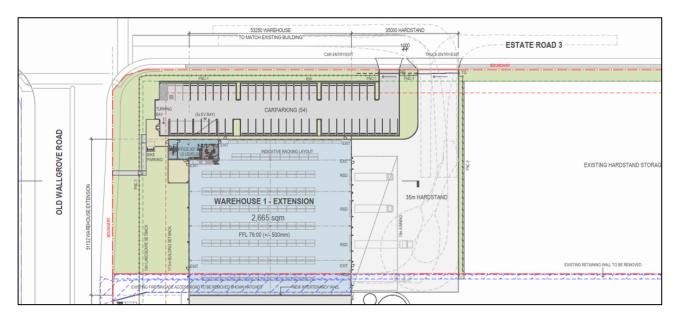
Proposed SSD Site Plan for the Precinct 1 Expansion
